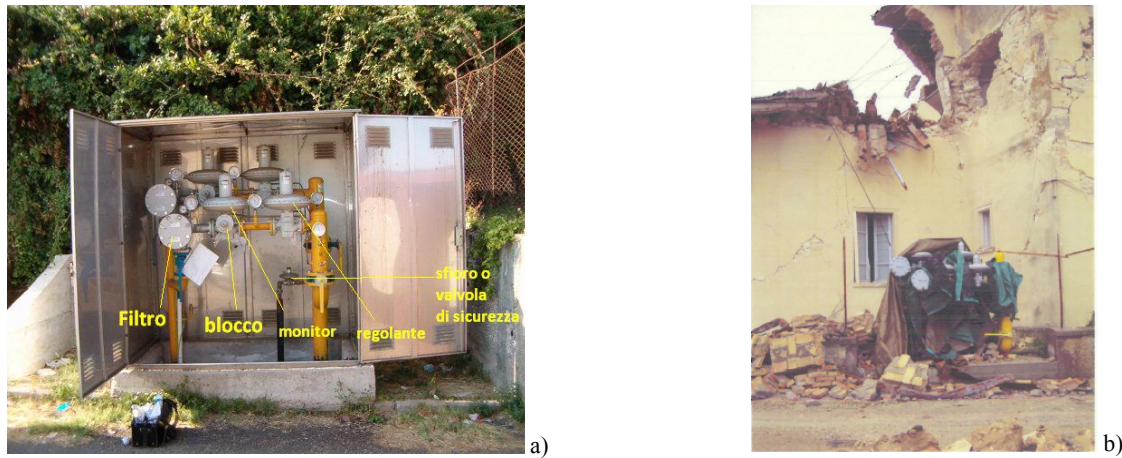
Reduction Group in L'Aquila, Italy: a) GR housed in a metallic kiosk; b) GR housed in a masonry kiosk closed to building and damaged following the 6th April 2009 earthquake.
